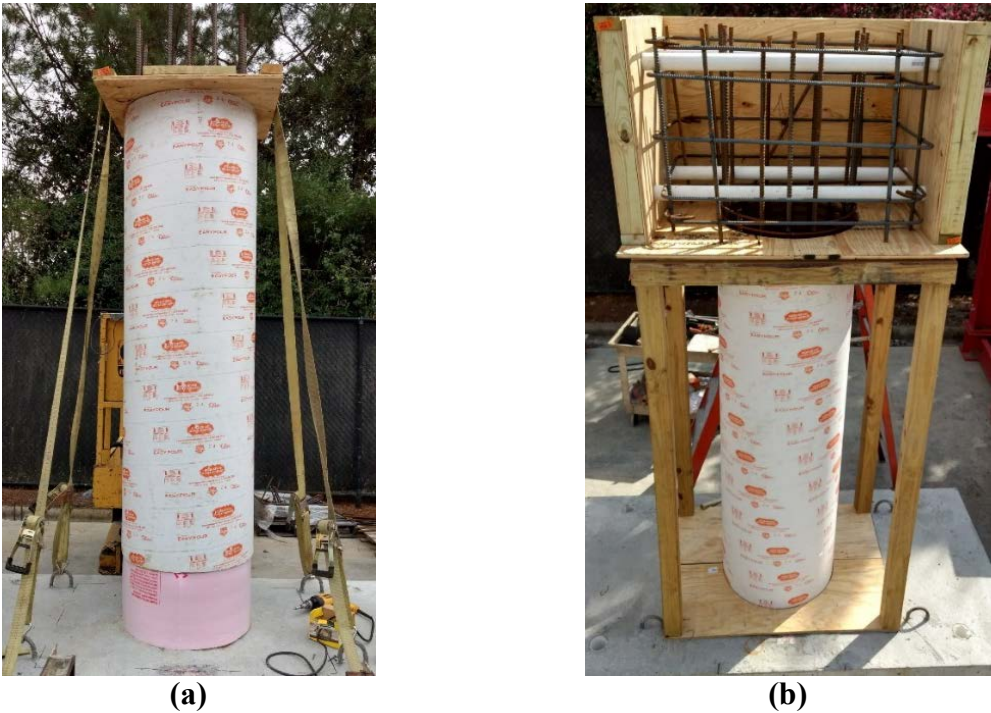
(a) Sonotube installation; (b) Cap stub formwork and reinforcement
